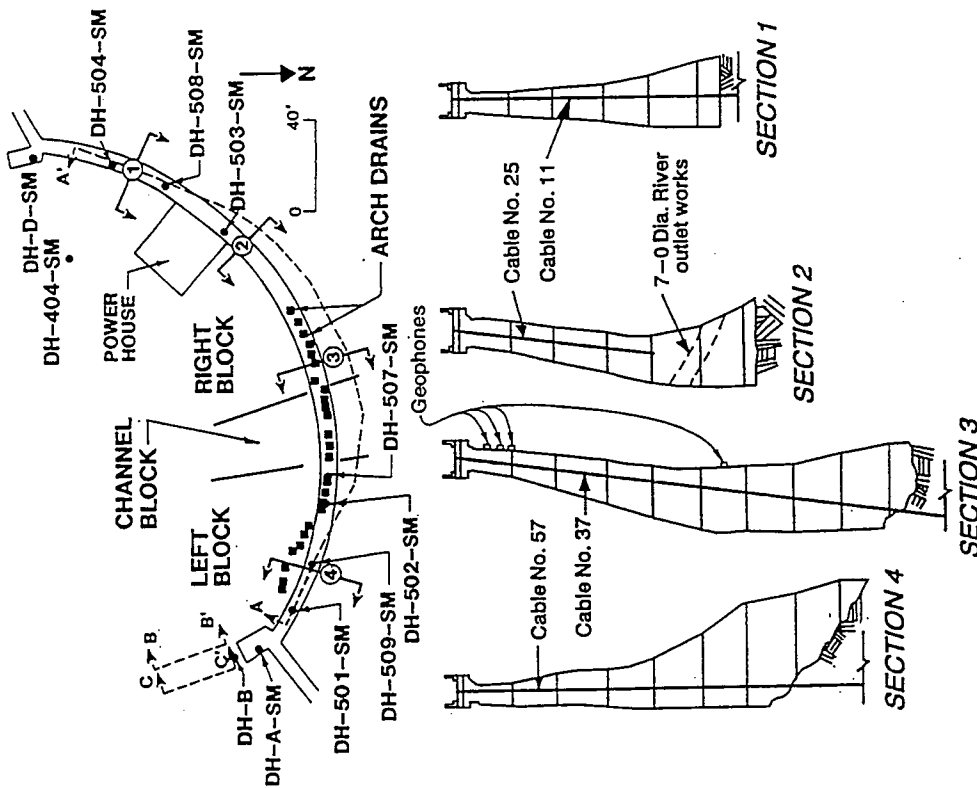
Typical sections through the arch, showing inclination of anchorages, positions of toe drains, and locations of geophones, Stewart Mountain Dam.
